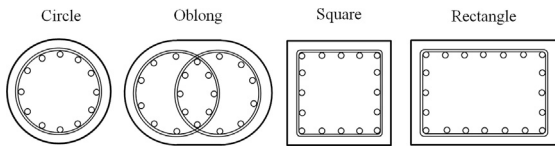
Cross-section of reinforced concrete columns with various shapes.
